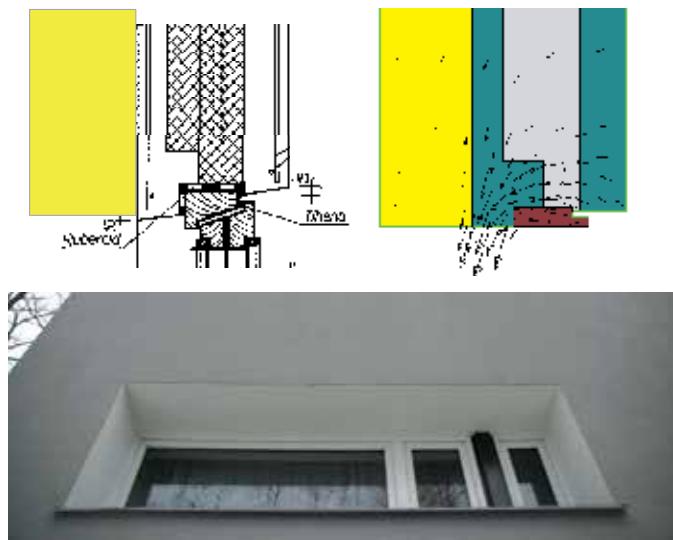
Thermal bridge in connection of window and insulated external wall (up). Window in insulated wall (down)
